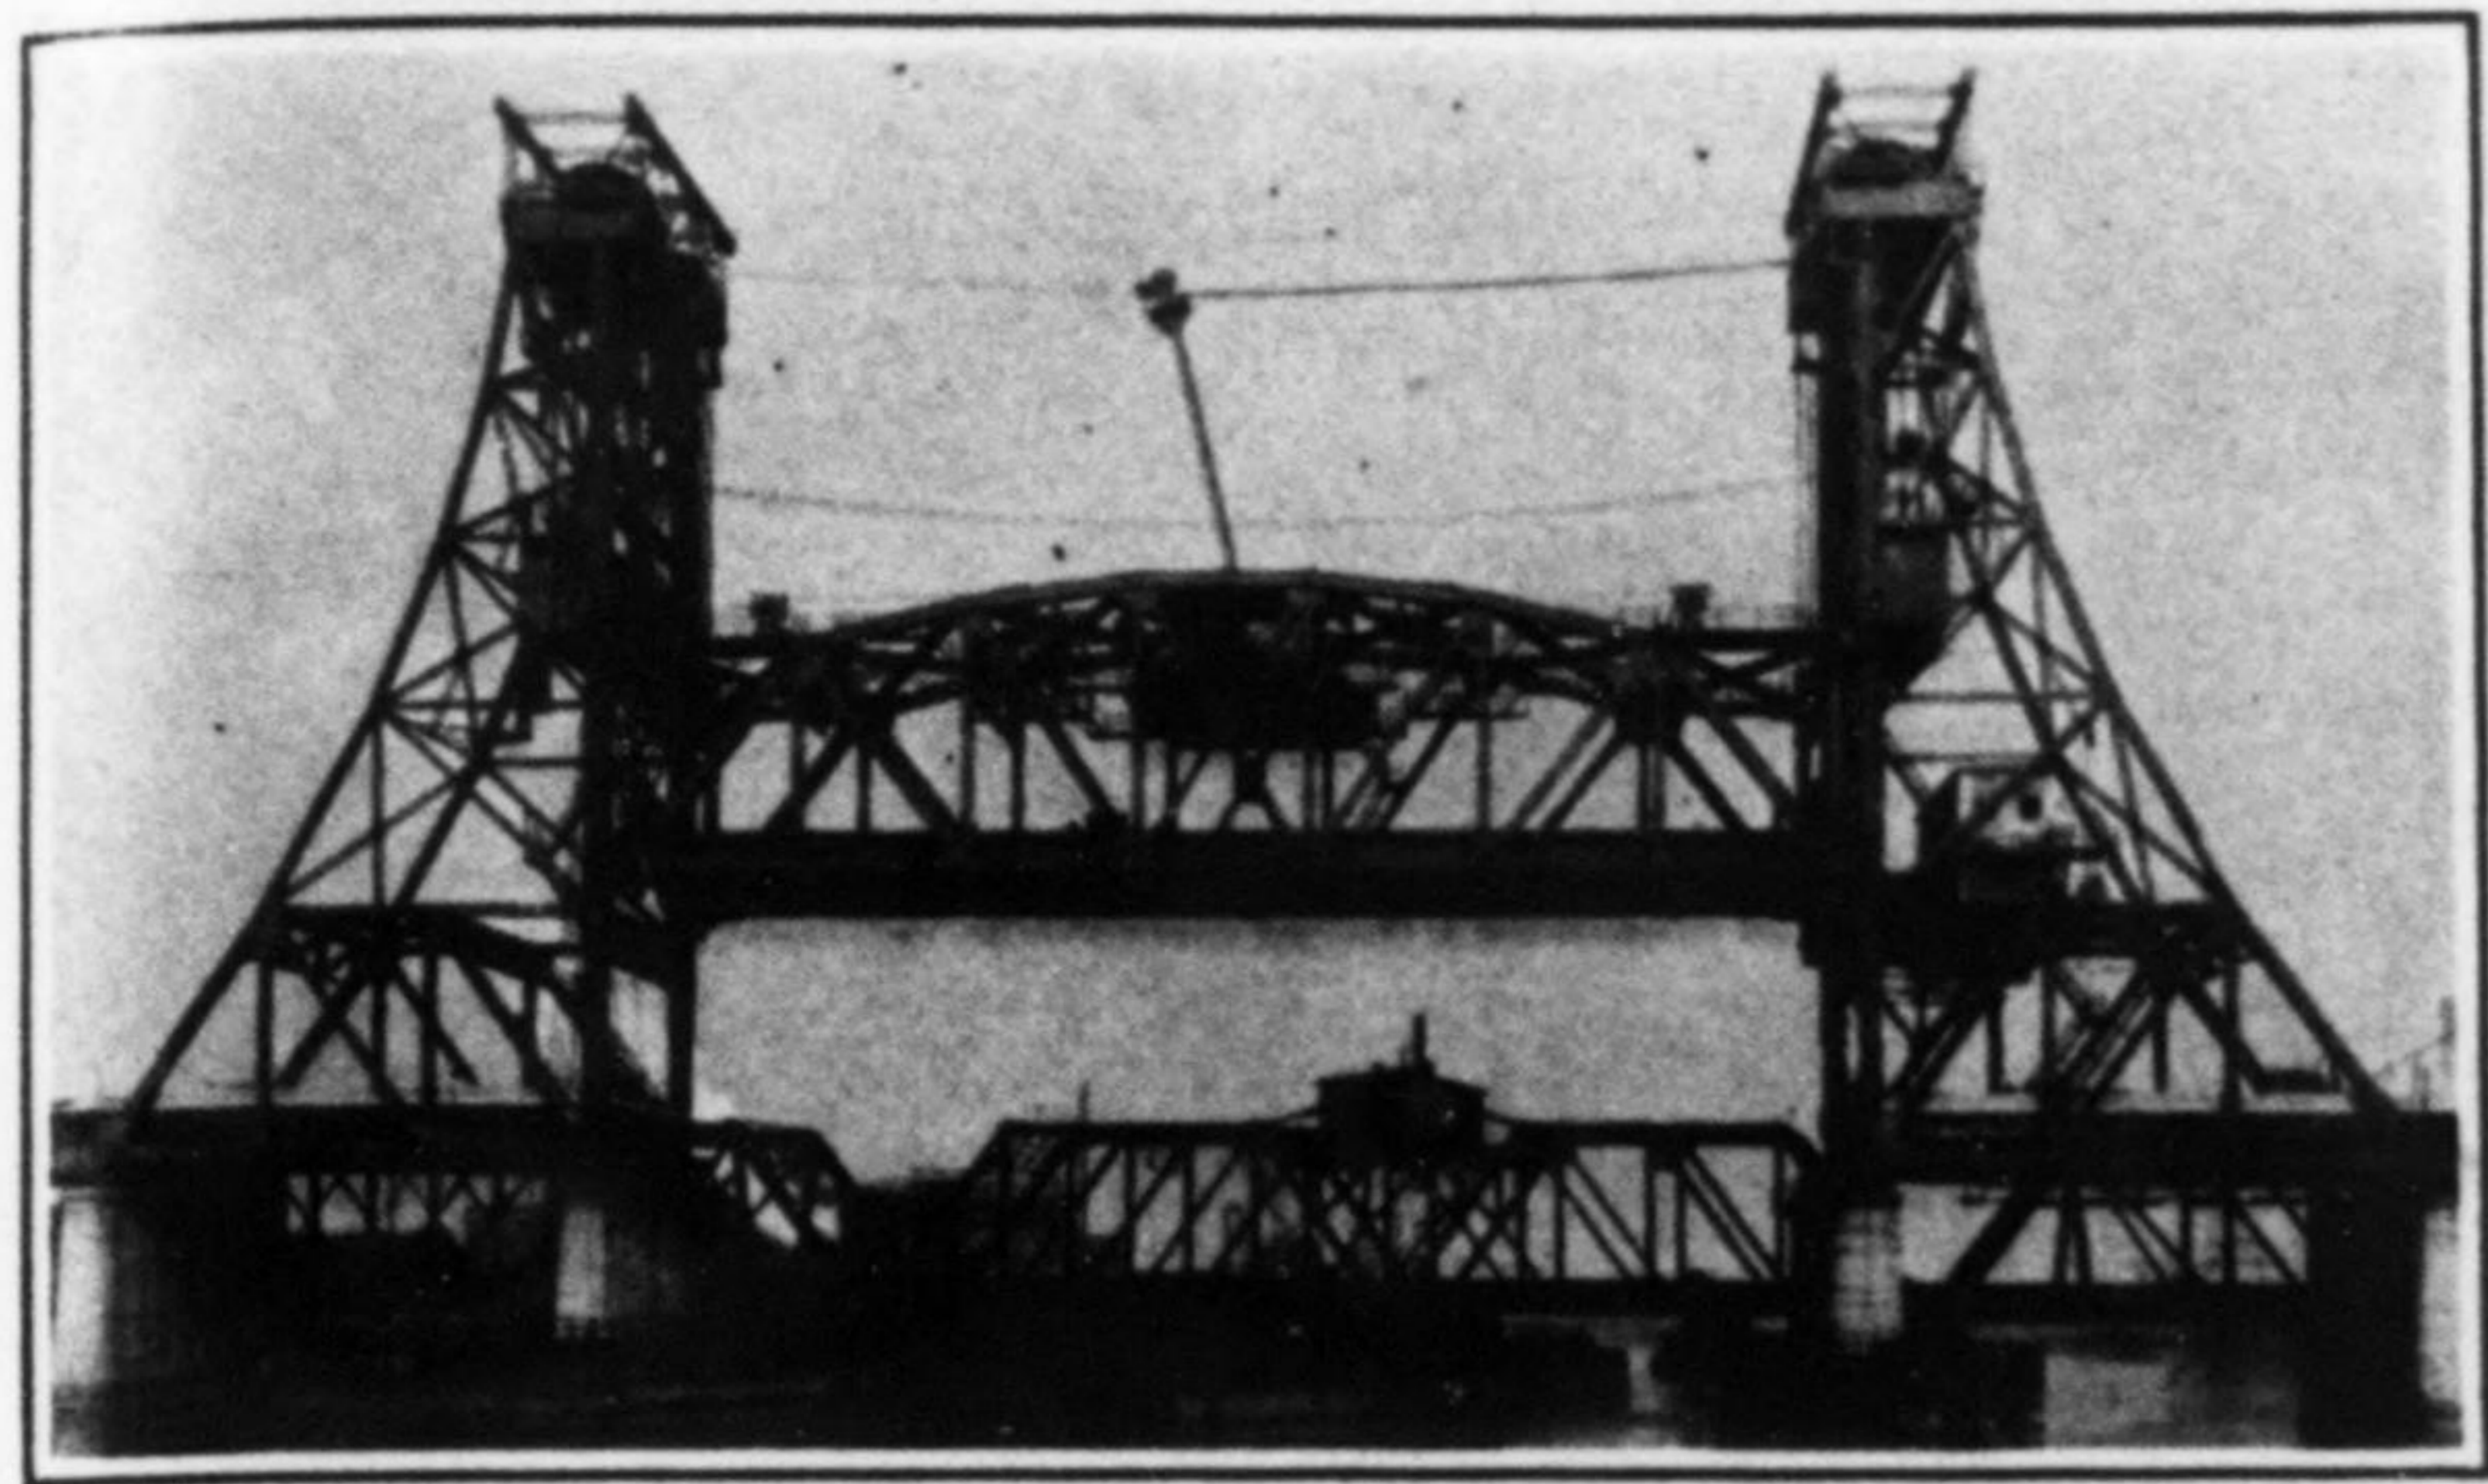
COMPLETED THREE-TRACK VERTICAL LIFT SPAN
